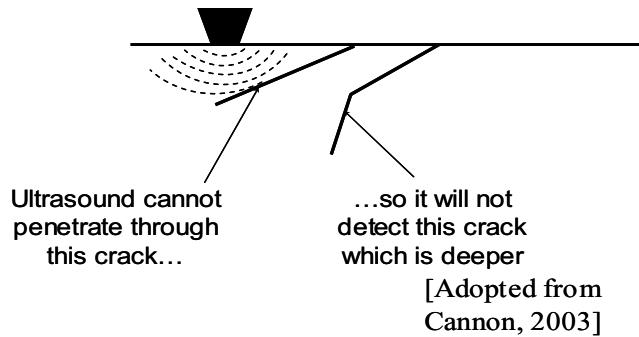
Detection undetected fatigue cracks on rail surface [20]
